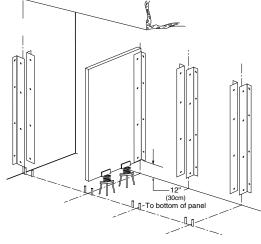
Overhead-Braced or Floorto-Ceiling Anchored Alcove Closed Layout.
